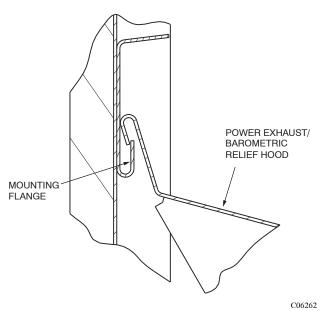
Barometric Relief/Power Exhaust Hood Flange
